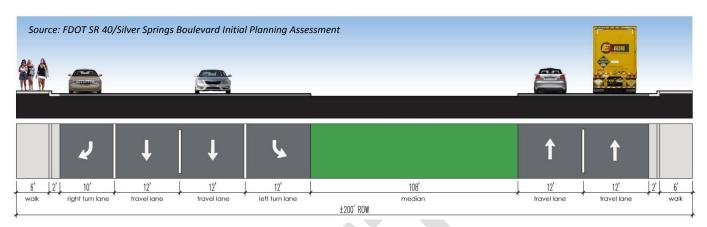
Existing Typical Cross-Section on SR 40 East of NE 49th Terrace
